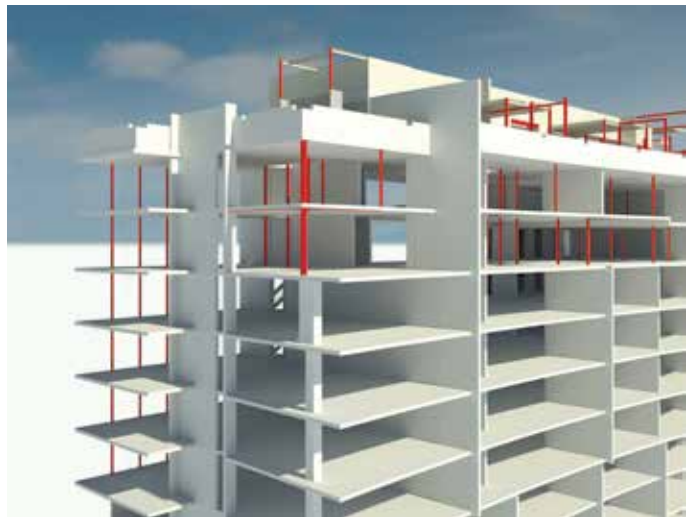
Revit model of hanging penthouse slabs, PT slabs, and roof PT transfer slab.
